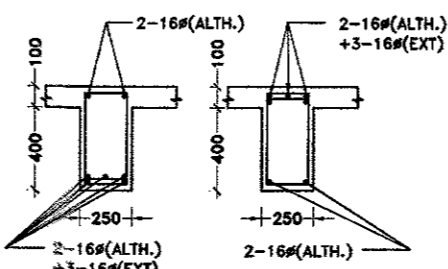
DETAILS CROSS SECTION OF THE BEAM (MKD. TB2)
